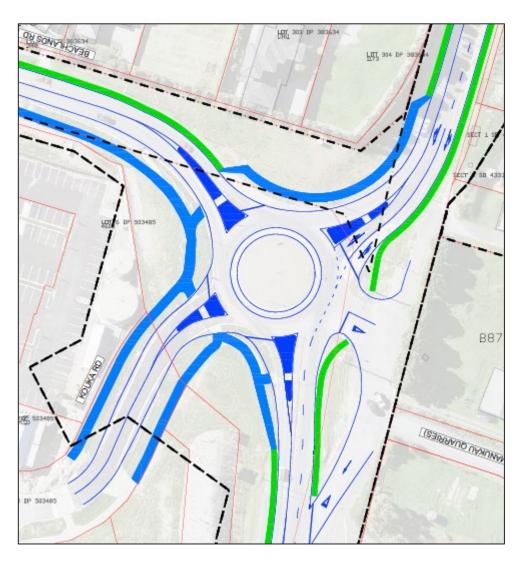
Proposed additional southbound approach lane at Whitford Maraetai Road / Beachlands Road roundabout
